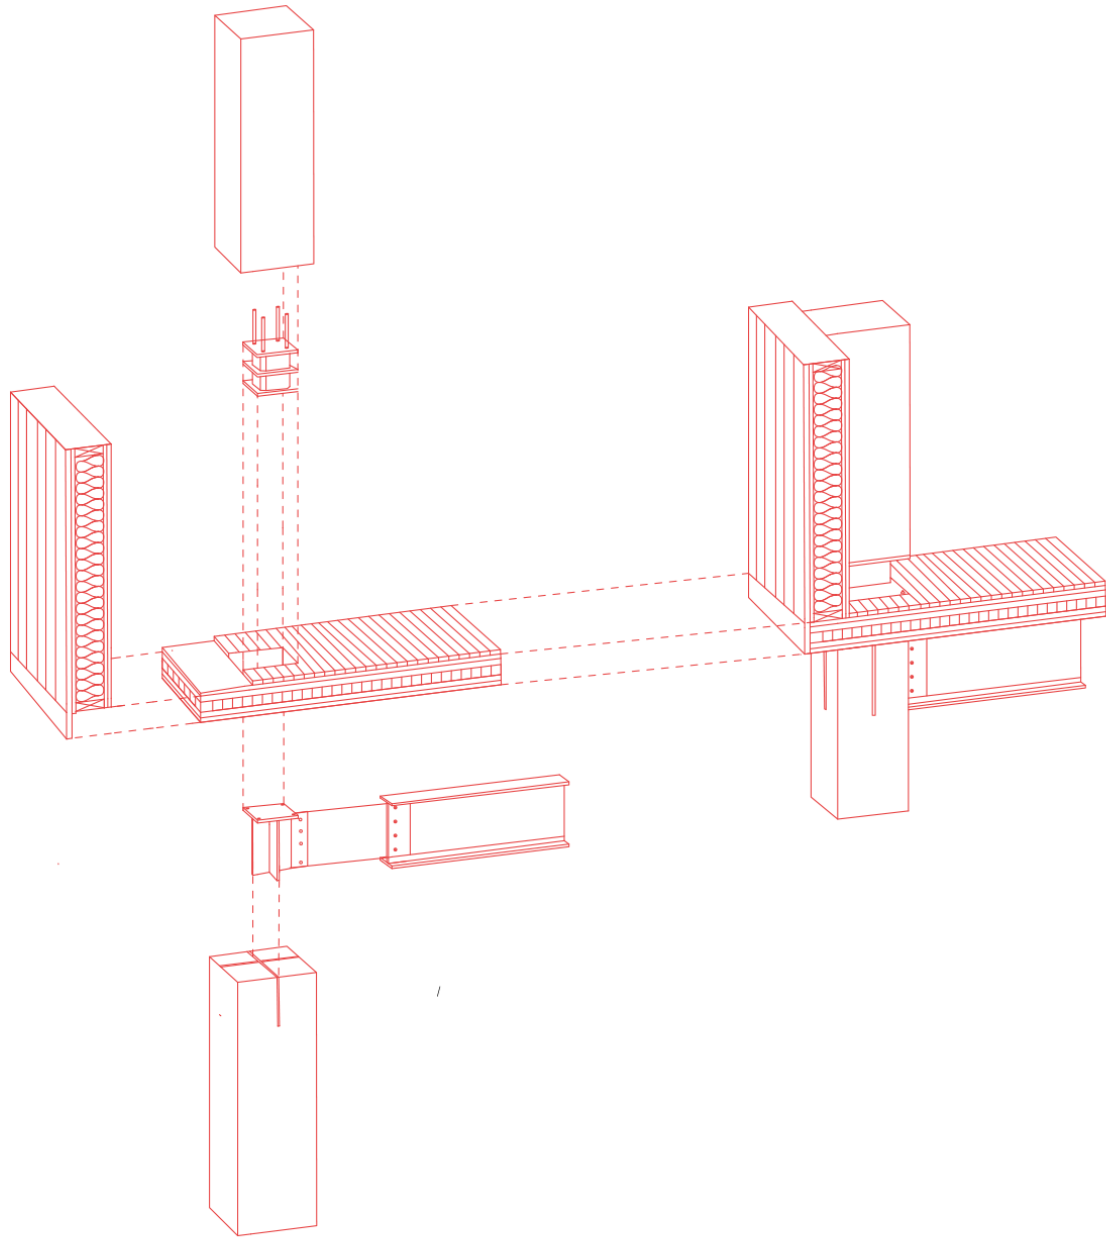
Exploded axonometric of glulam construction of the renovated Northern Brewery complex.
